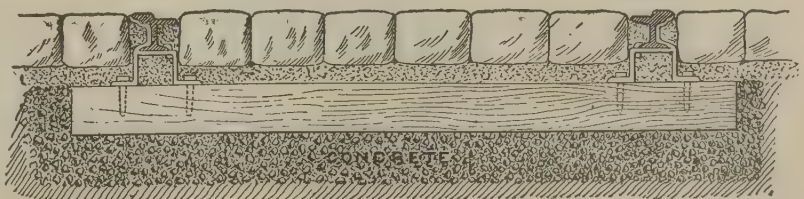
CROSS SECTION, GIRDER RAIL ON CONCRETE FOUNDATION.
